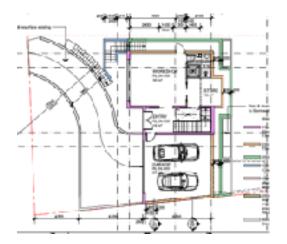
Lower ground floor on boundary Michael Fountain Architects
